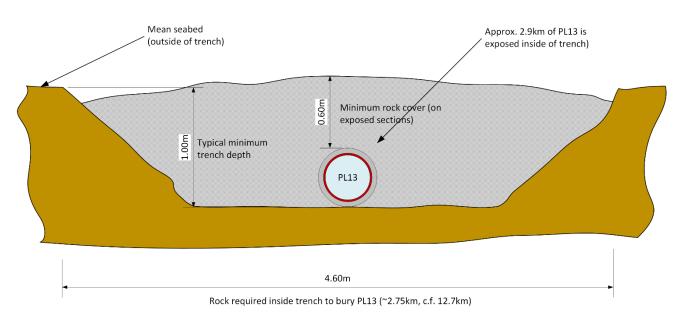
PL13 new rock over exposed pipeline inside trench
